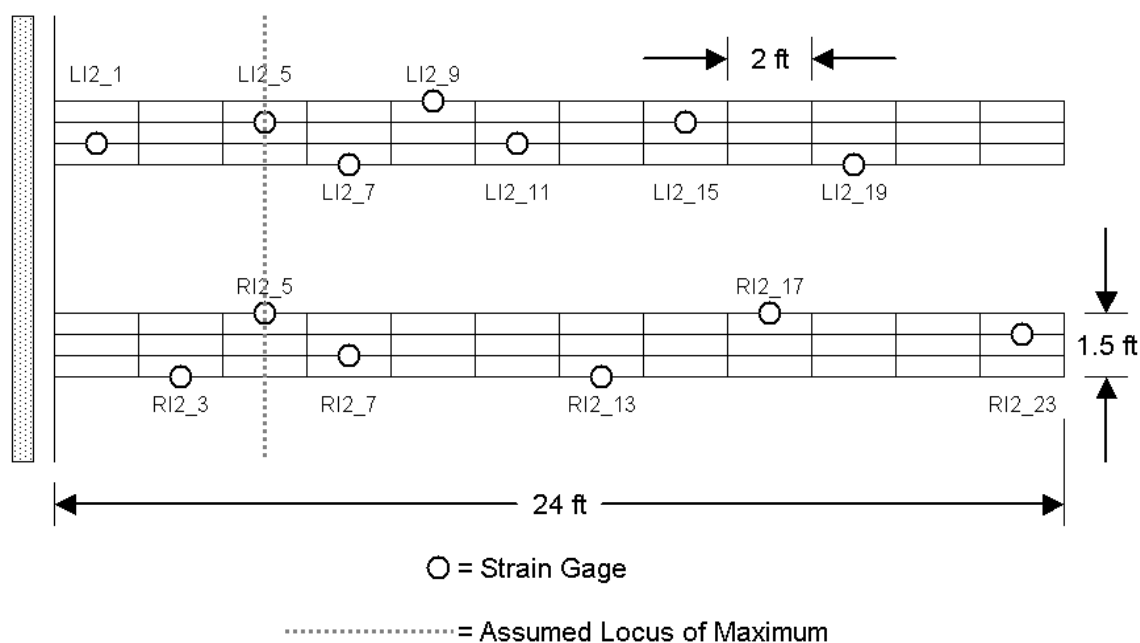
Plan view of instrumented primary bar mat IL2 at level 2 located in the intermediate and primary reinforced section.
